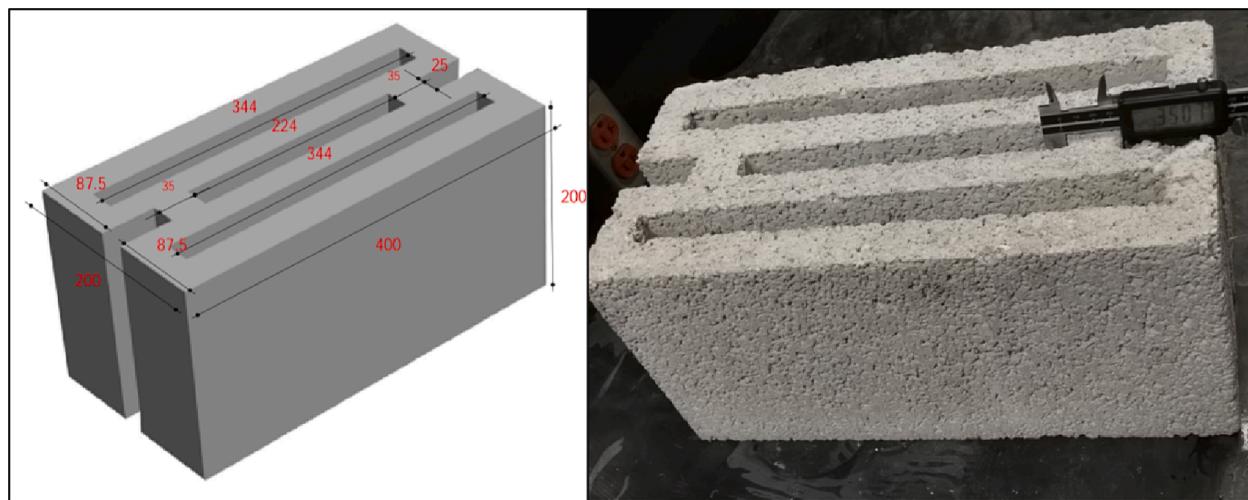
Geometry of the manufactured blocks (all dimensions in mm).
